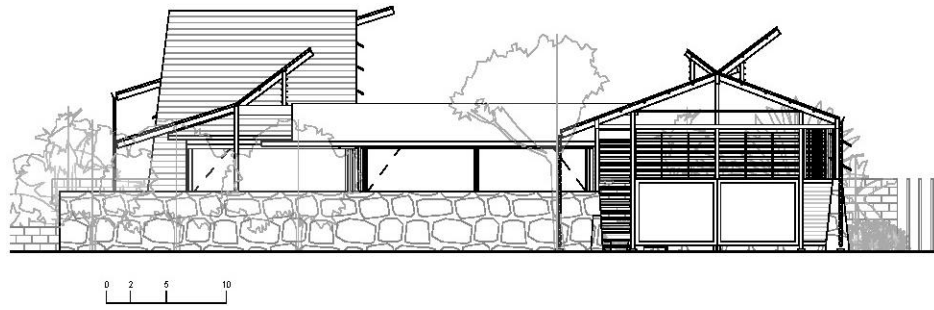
Project A, *Diamond Head Elevation*. Scale: $1/16" = 1'-0"$
